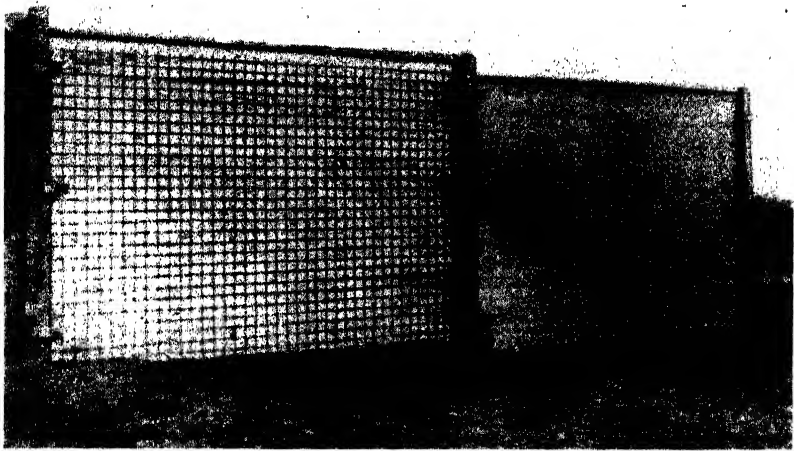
GUNITING TO WALL PANELS IN PROGRESS
